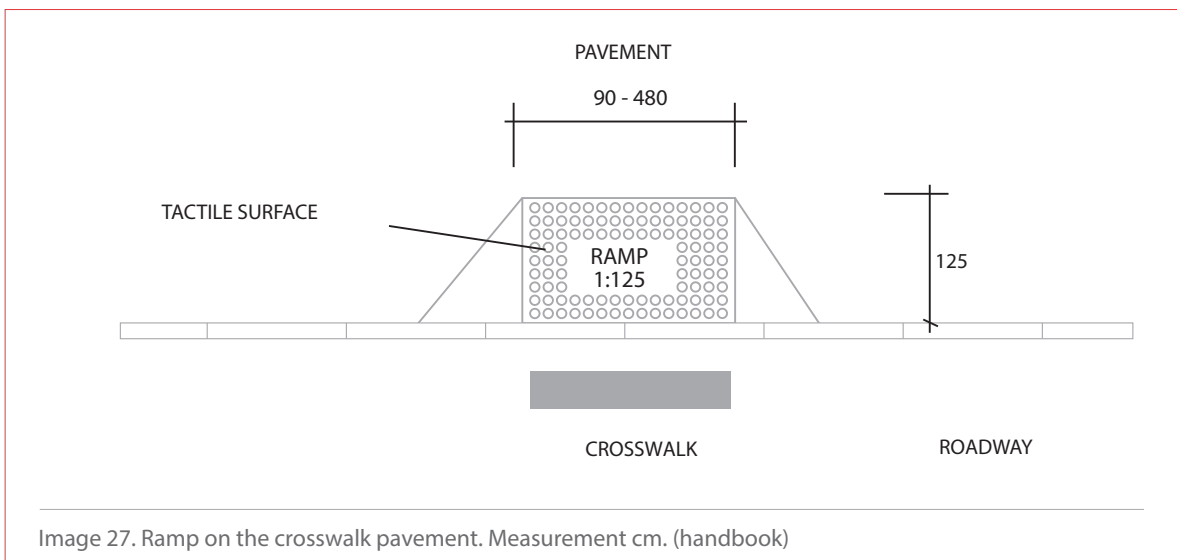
Ramp on the crosswalk pavement. Measurement cm. (handbook)
